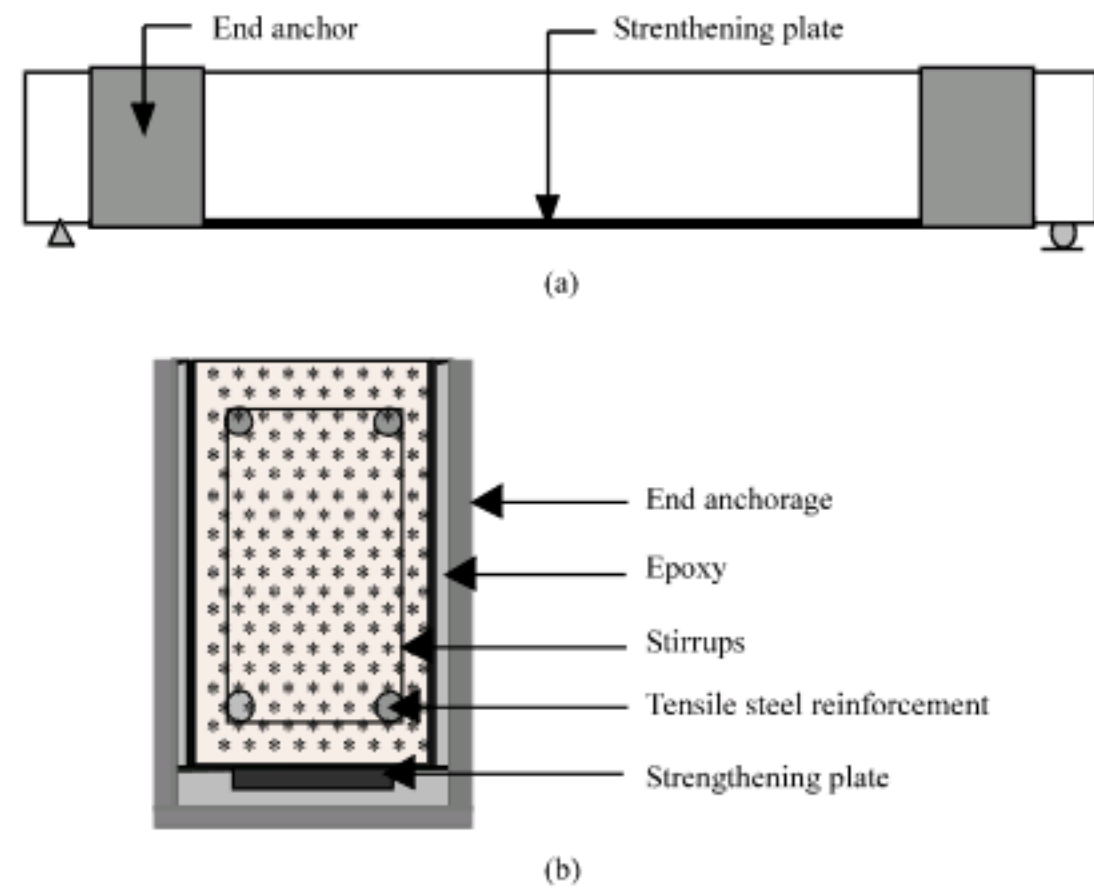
End anchorage details, (a) front view showing the positions of end anchorage and (b) cross-section of the end of the beam showing the end anchorage
